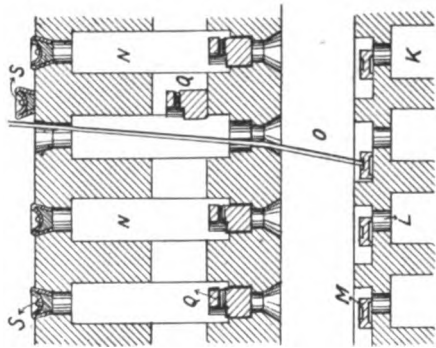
LONGITUDINAL SECTION THROUGH HEATING FLUES.
